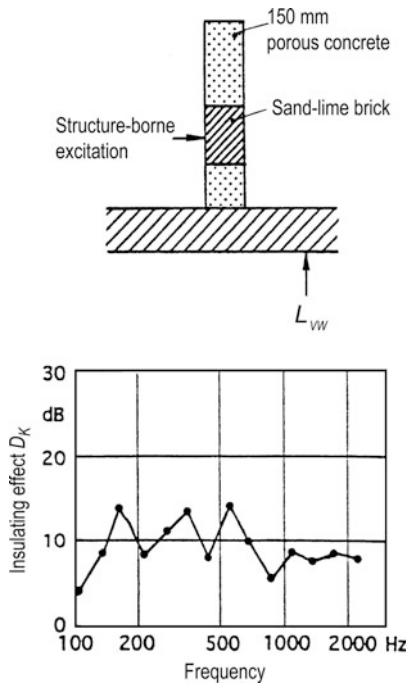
Insulating effect D_K of an inhomogeneously constructed installation wall (heavy sand-lime bricks at the point of excitation and light porous concrete bricks for the remaining wall); model test, values converted to large-scale construction
